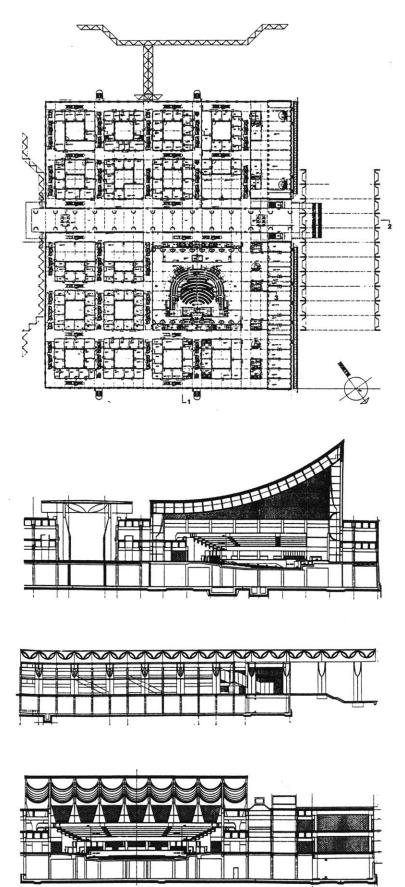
National Assembly Building, ground floor plan, longitudinal section in main corridor and cross sections in Assembly Hall.
